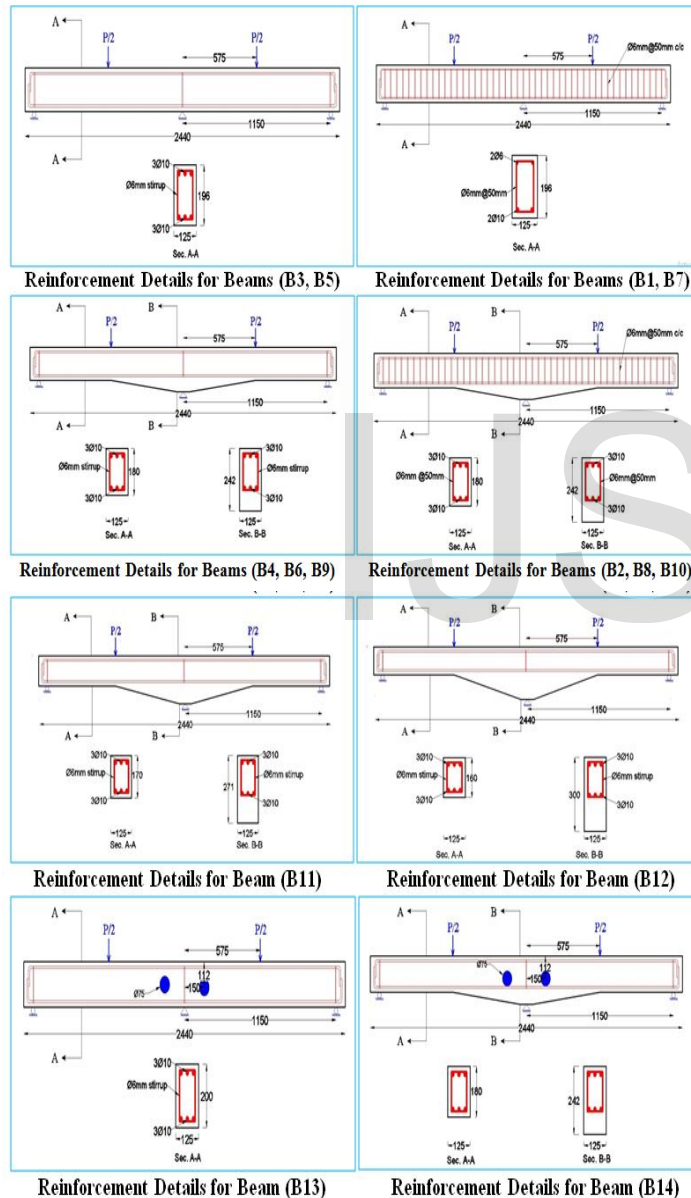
Show the Reinforcement Details and Geometry for Tested Specimens
